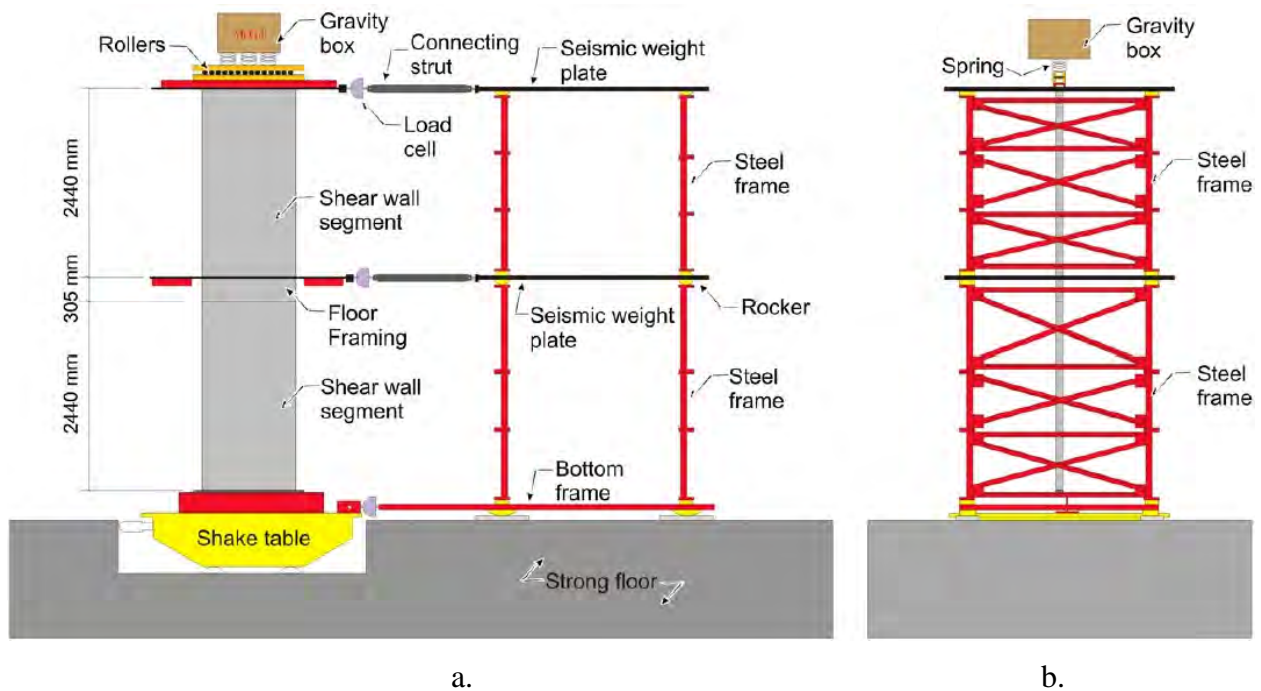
Shake table test setup for double-storey cold-formed steel shear walls: a. side elevation and b. end elevation
